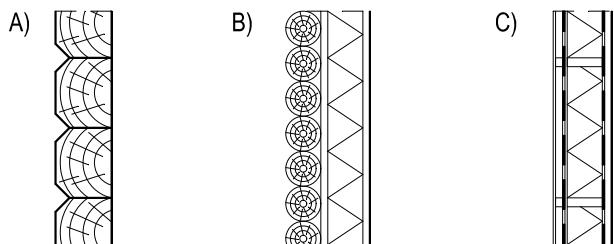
Examples of wooden wall constructions (Source: own elaboration)
